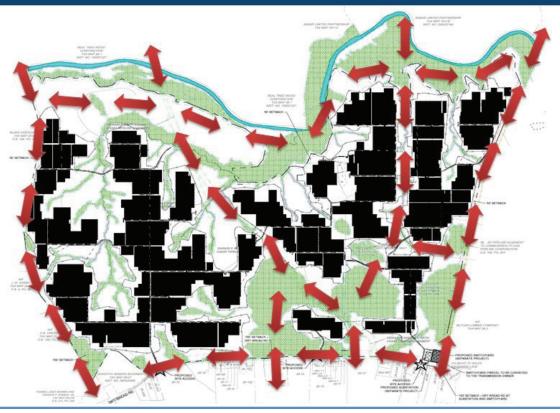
A conceptual site plan for a 1,491-acre utility-scale solar facility showing wildlife corridors throughout the site. Courtesy Dominion Energy.
